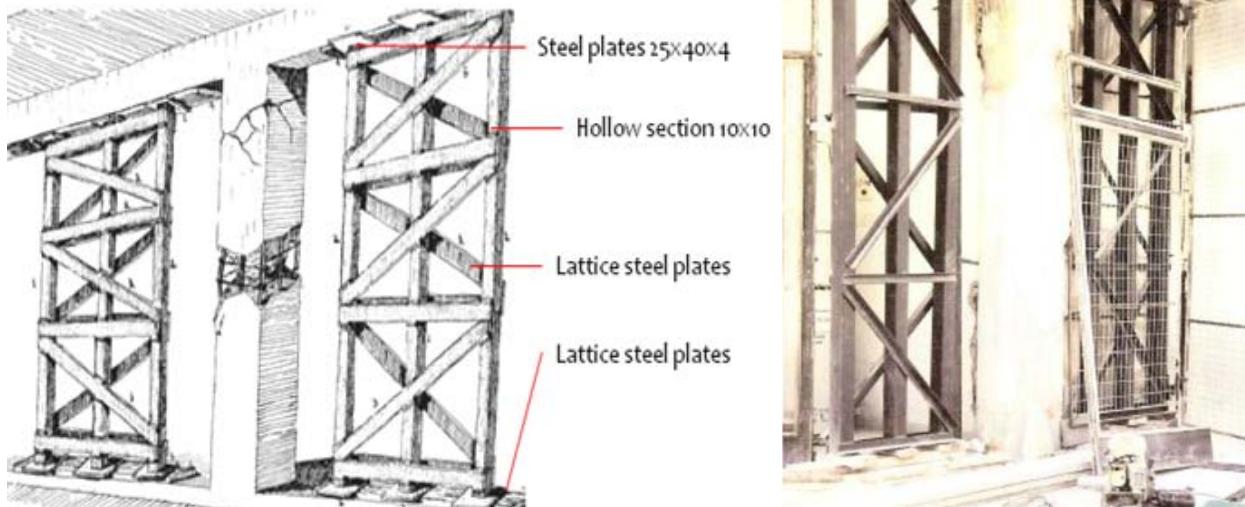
Propping with hollow section beams on either side of damaged column (EPPO, 2000)
